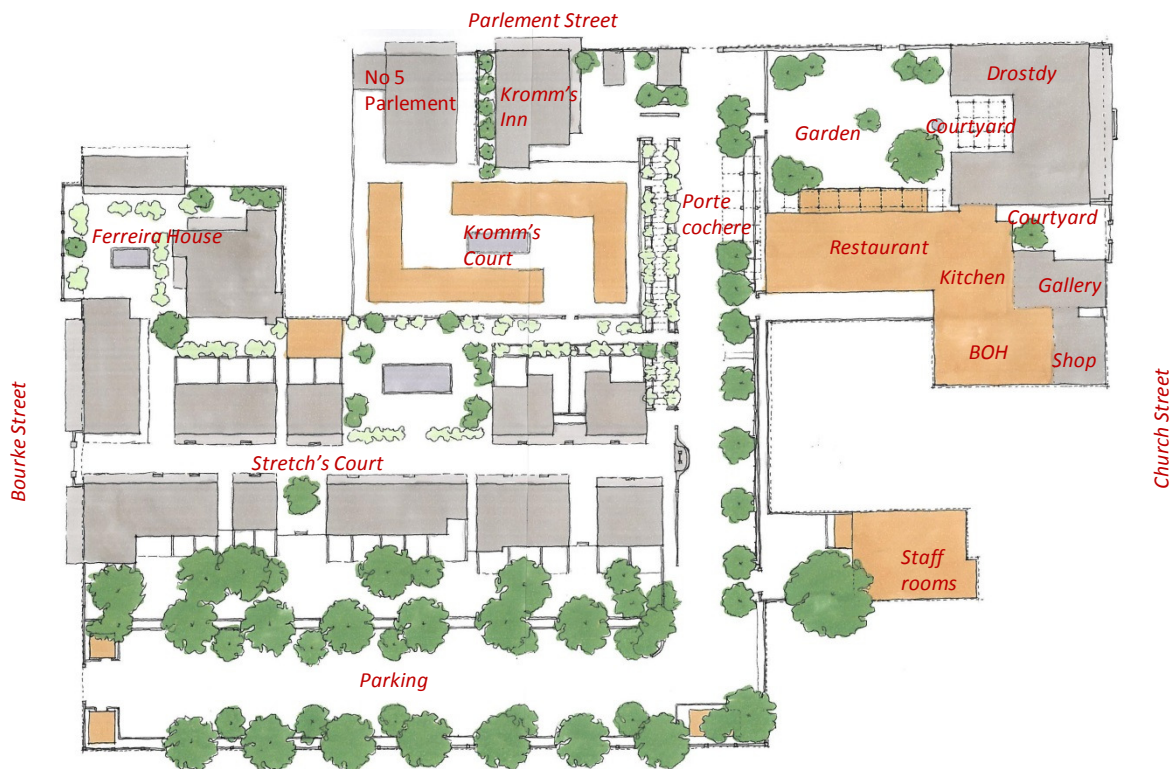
Indicative proposed master plan [refer to Annexure C: dhk Architects]
